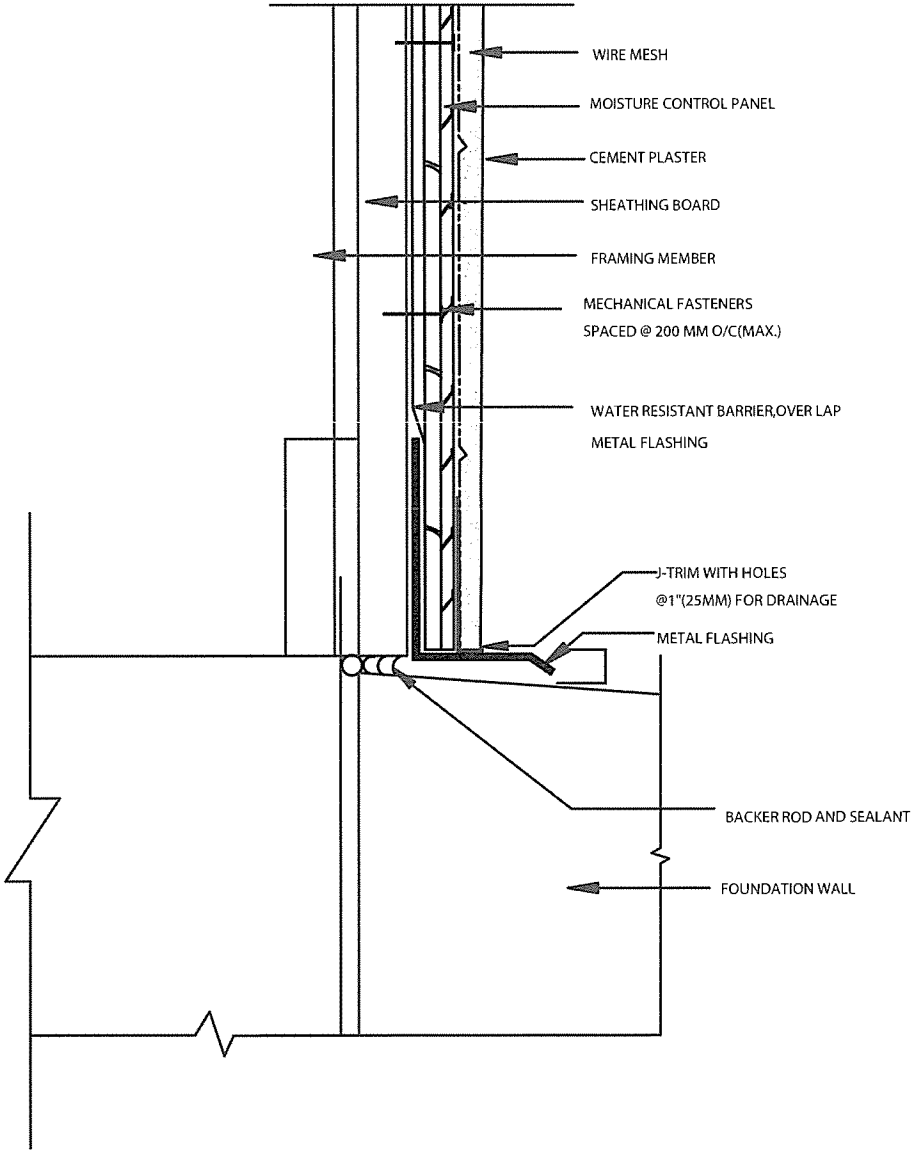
TERMINATION AT CONCRETE FOUNDATION
